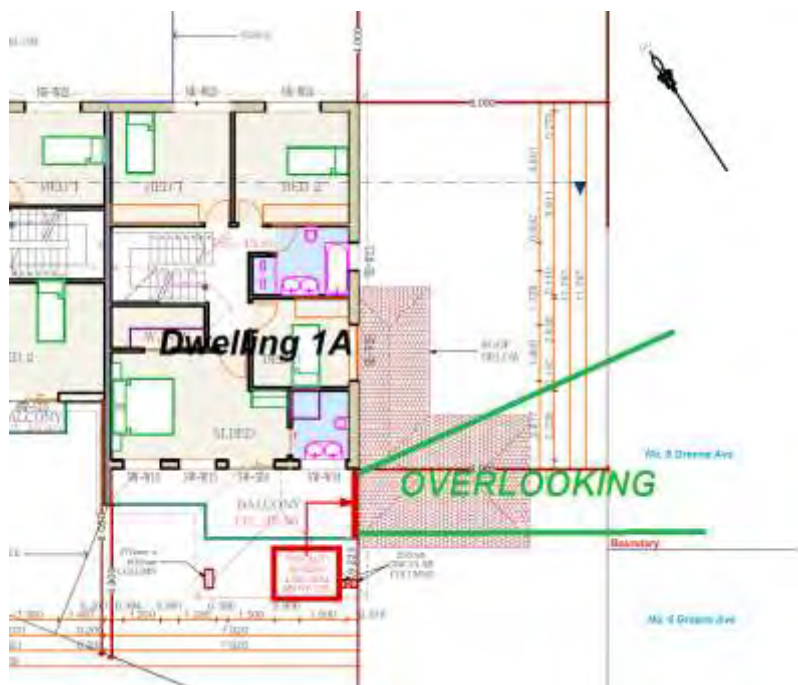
First floor plans showing concerns for overlooking raised by No. 8 Greene Ave
